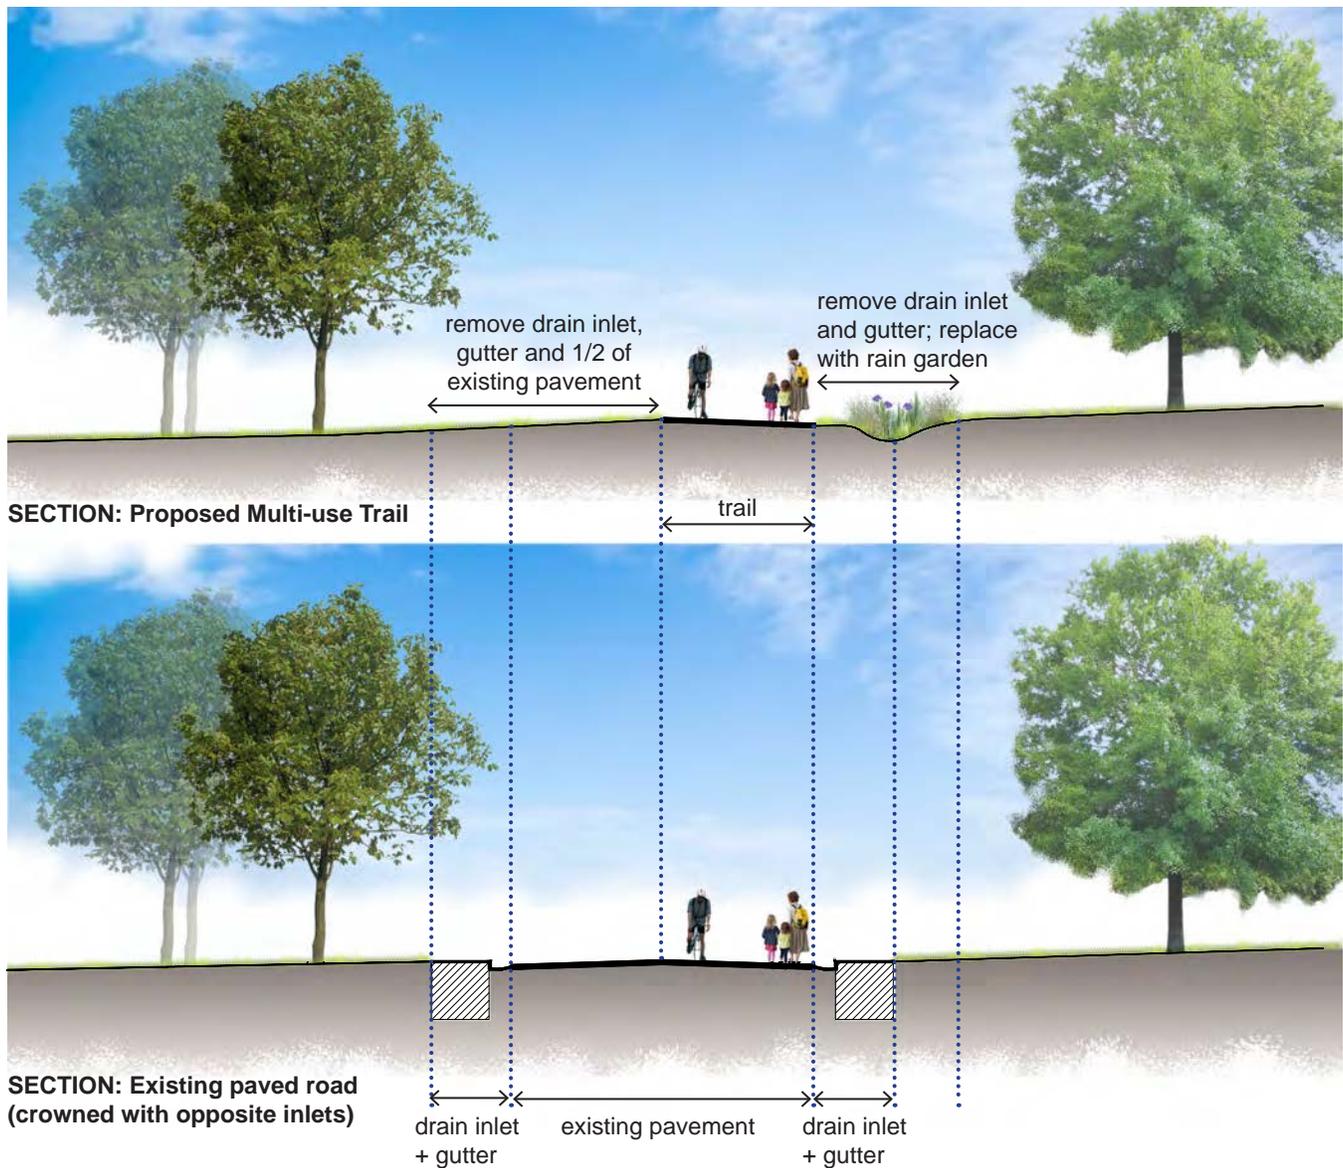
Section drawings showing the reduction in width of existing streets to support multi-use paths
